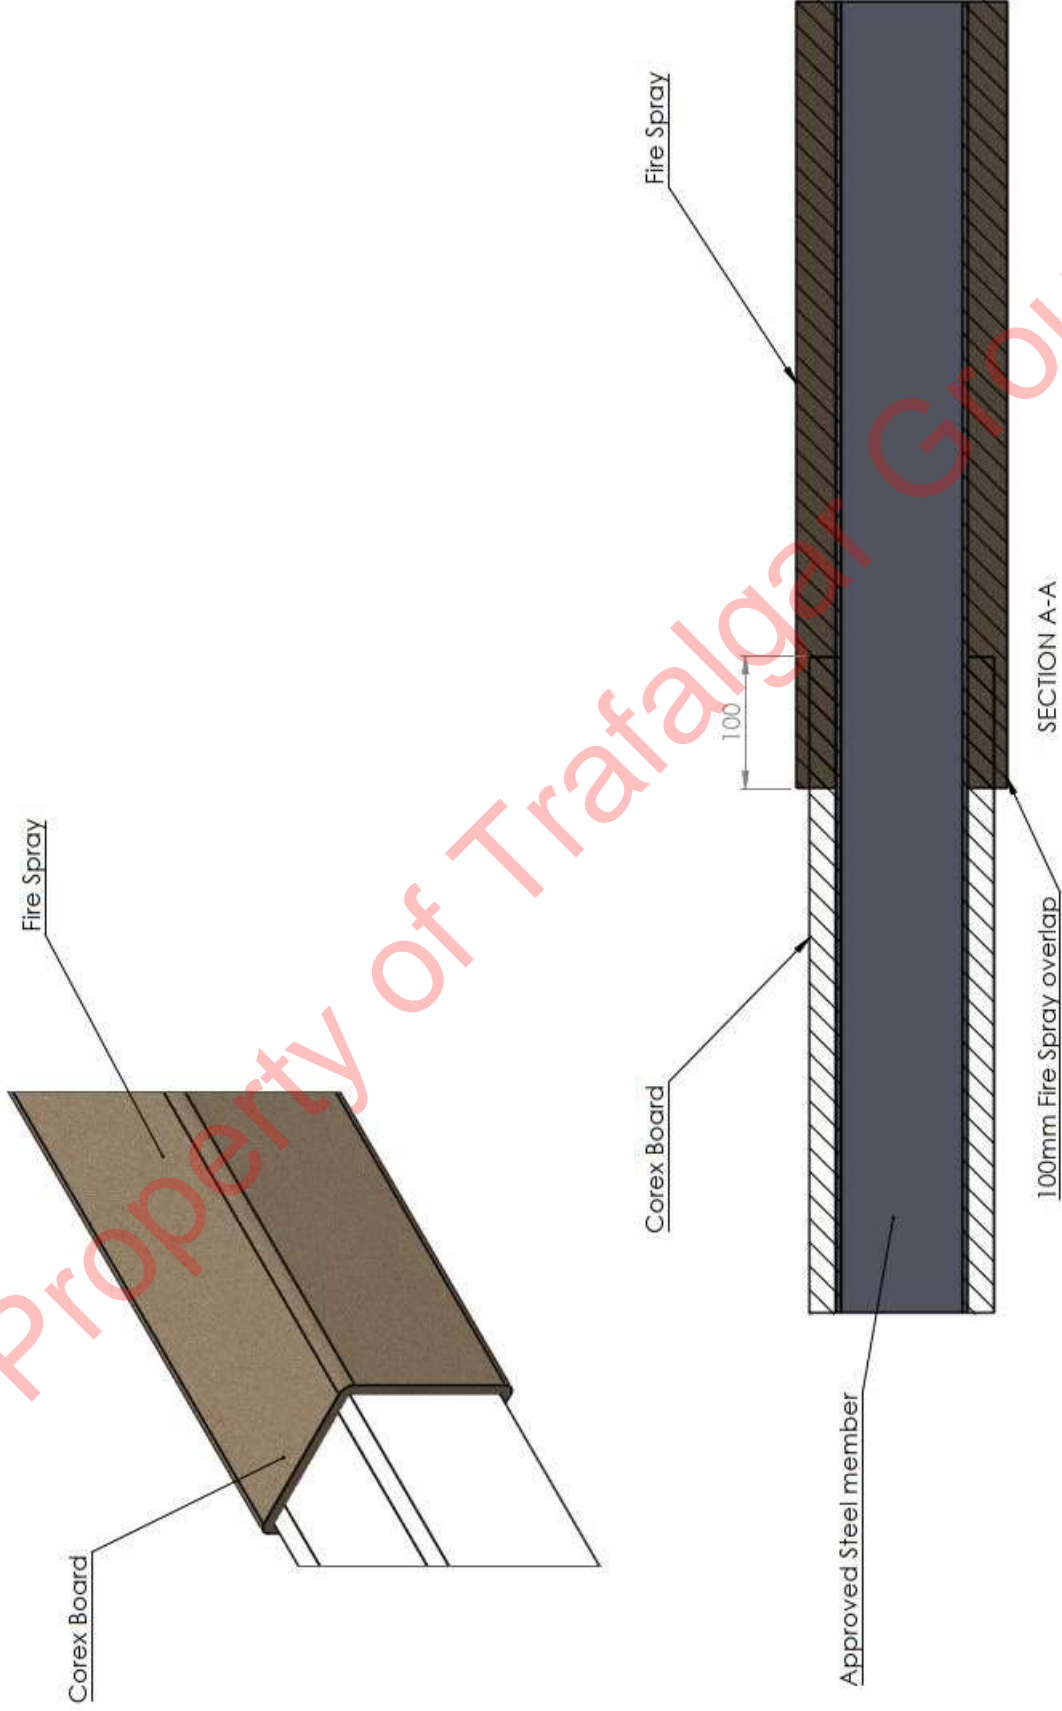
The construction detail when the spray protection system is added next to the existing board protection system – Option 2
